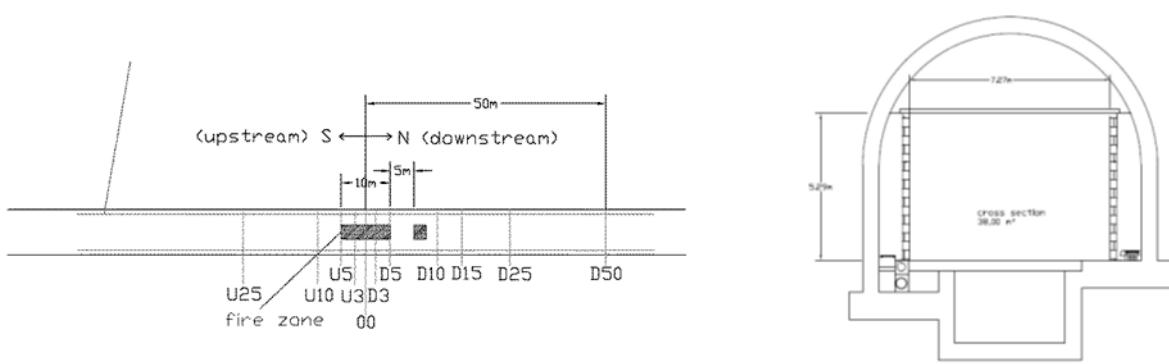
Top view on the test tunnel with measurements positions, Cross-section drawing of the test tunnel
